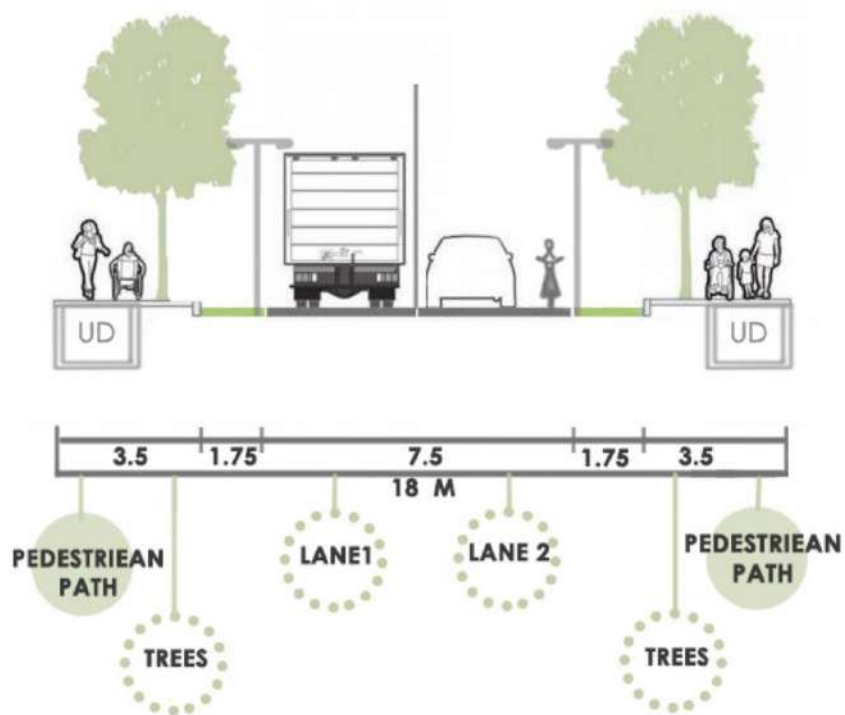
Typical layout of proposed 18m road (All Dimensions in meter)
